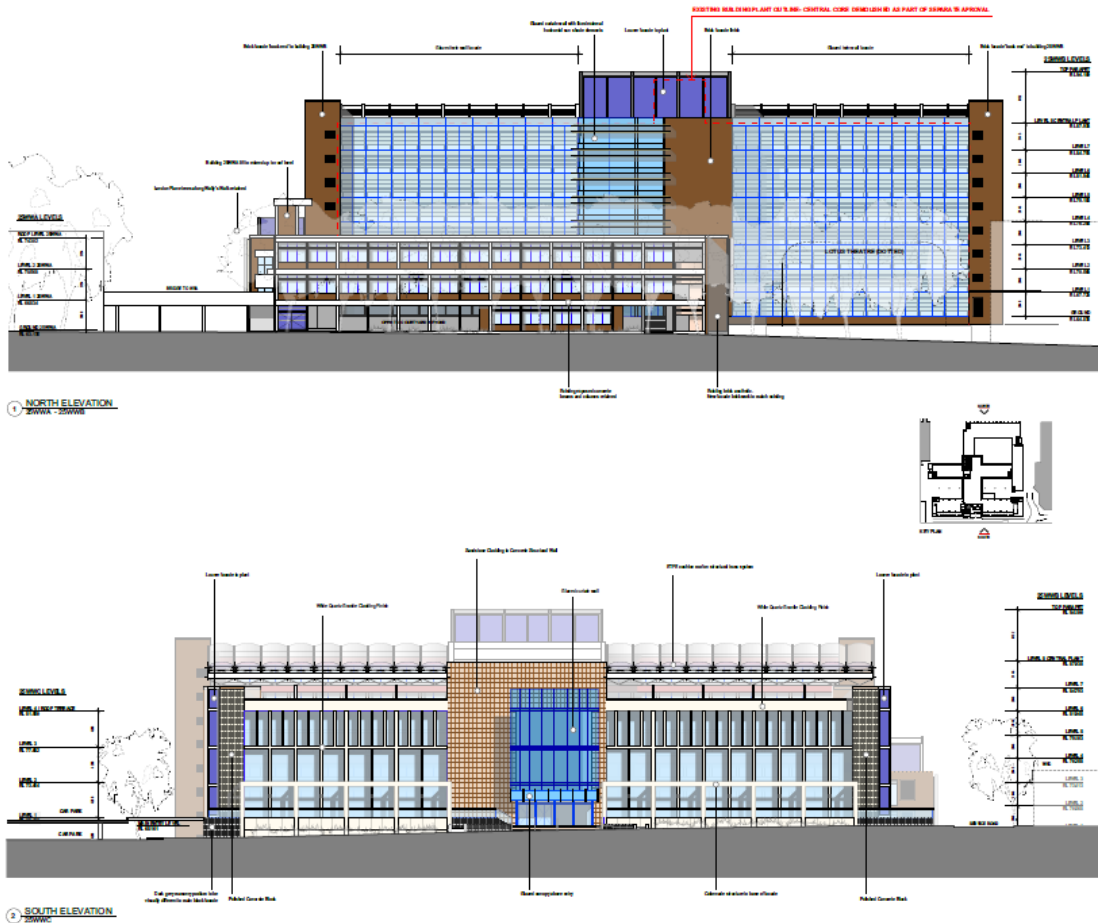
Proposed development, North (top) and South (bottom) Elevations
